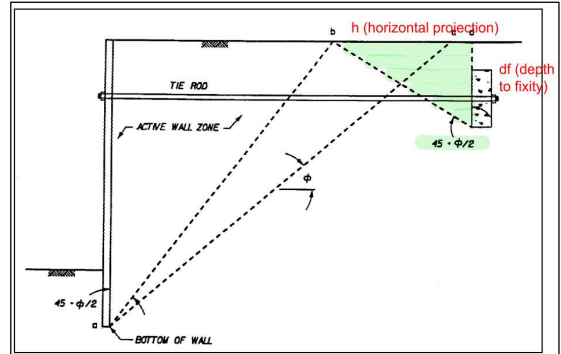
Minimum anchor - wall spacing for full passive anchor resistance in homogeneous soil
